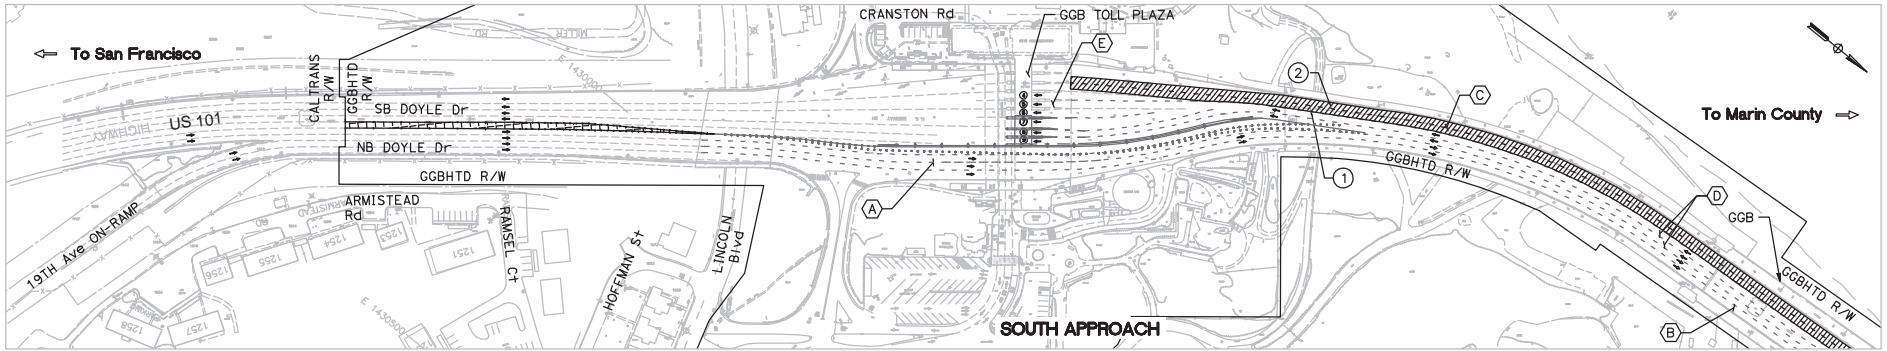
Stage Construction - South End Improvements-Toll Plaza
